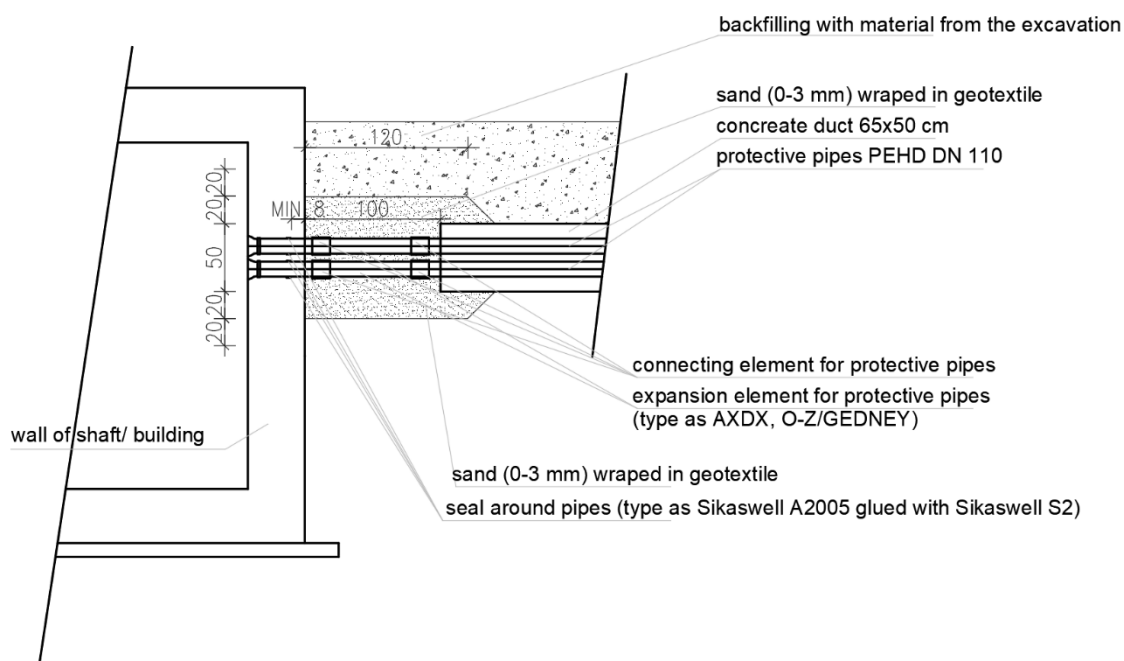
Watertight Pipe Penetration Detail at the Connection Between PEHD Pipe and Reinforced Concrete (RC) Walls of TP
